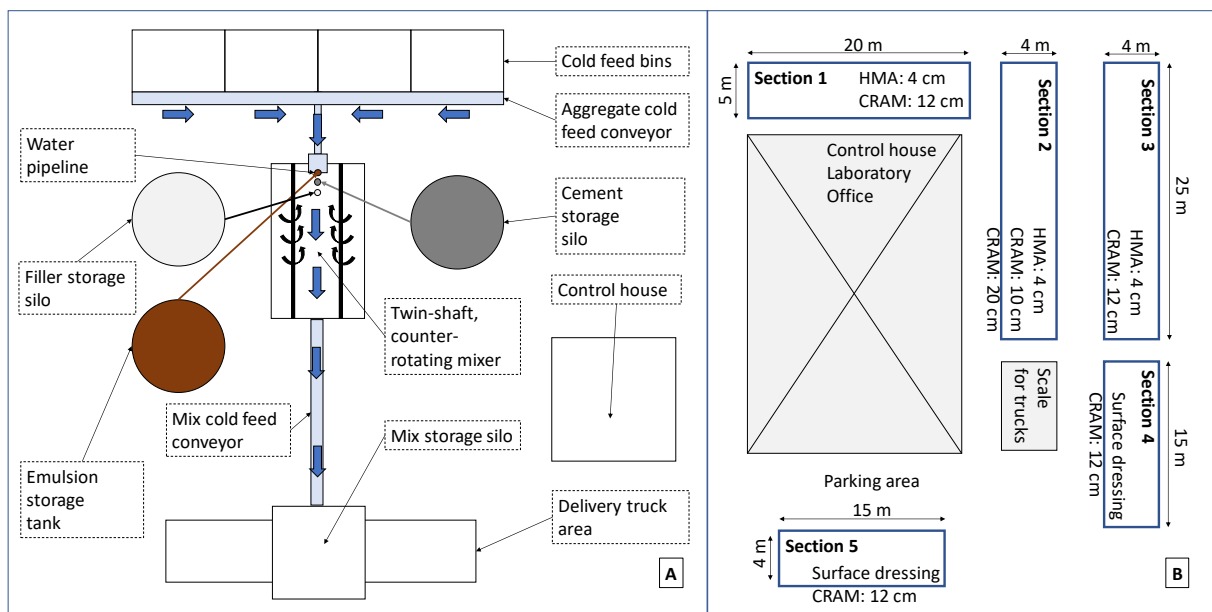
Scheme of the mixing plant (A) and trial section (B)
